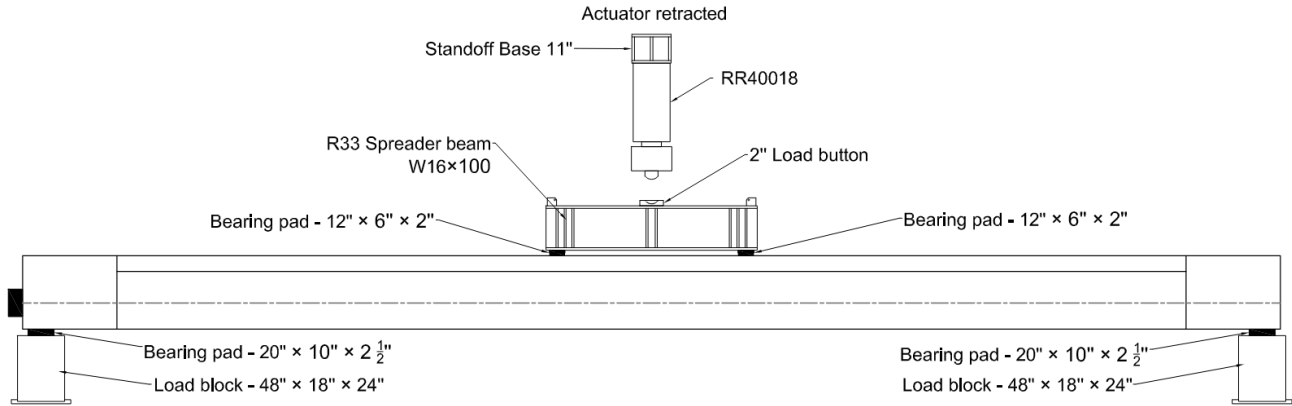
Test setup for pre-impregnation cracking beam specimen S06.
